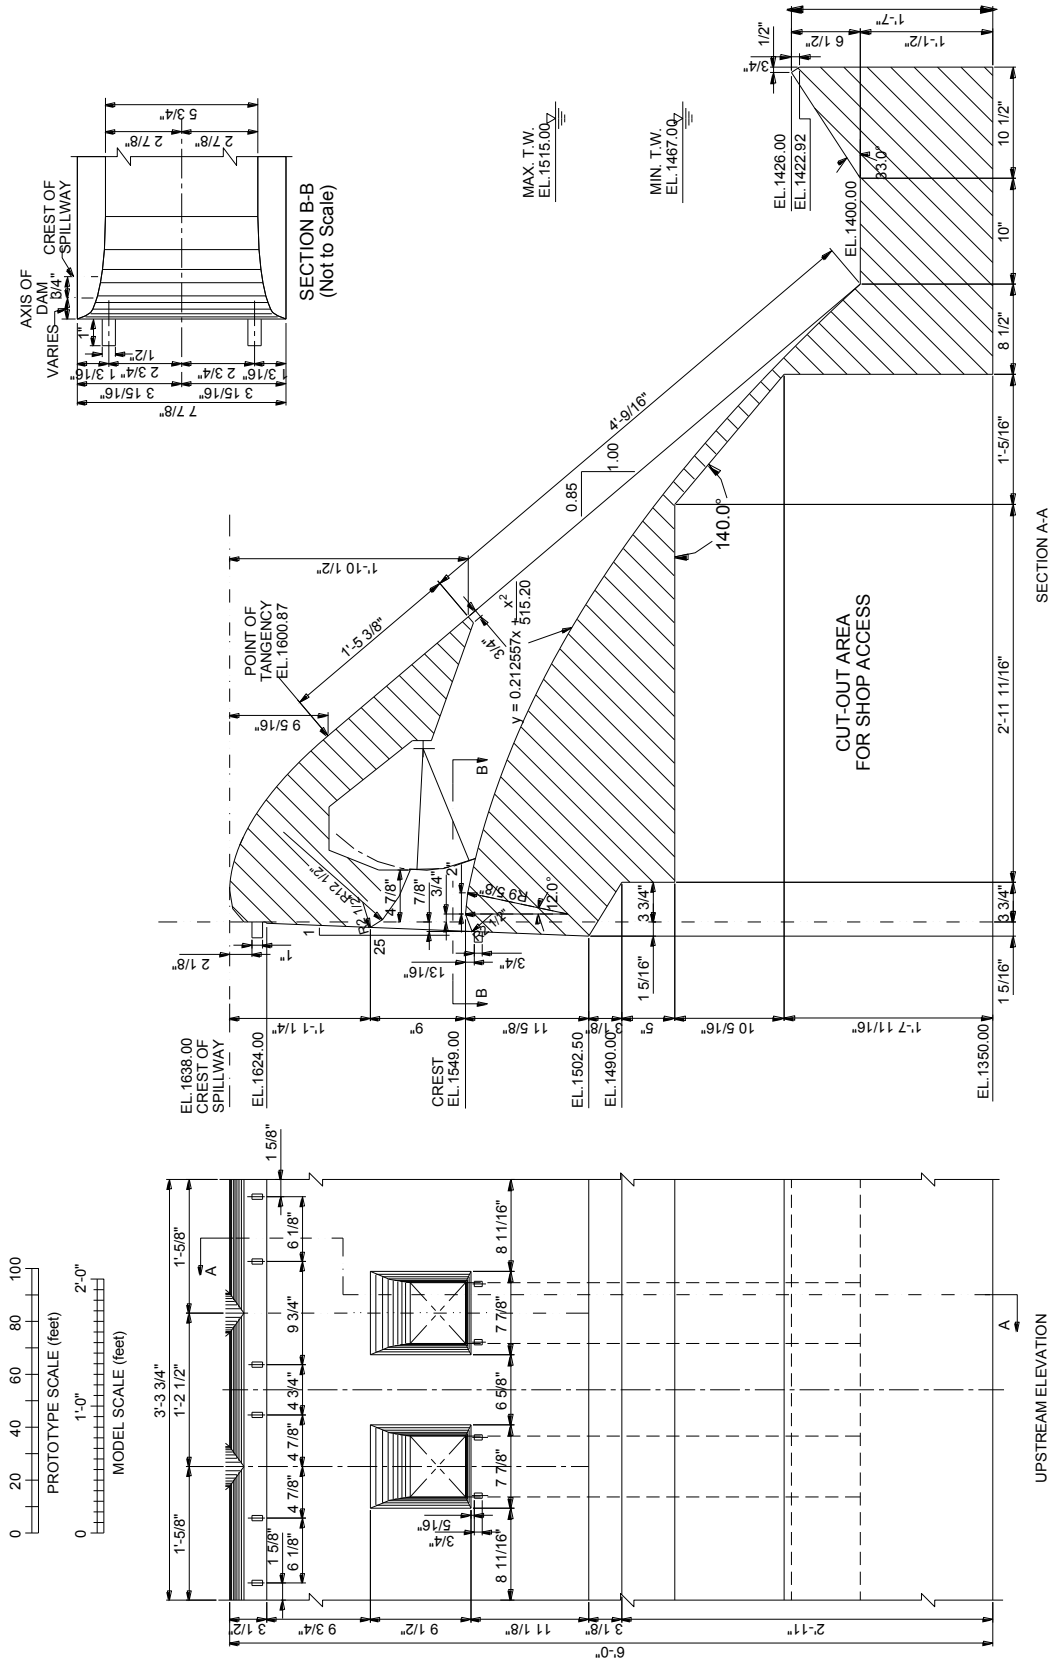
Upstream Elevation and Section Through Sluiceway of 1:48 Sectional Model
